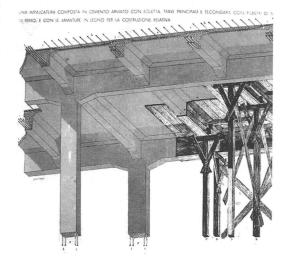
Typical reinforced concrete structural system, consisting of pillars, main and secondary beams and slab, constructed according to the Hennebique patent. (Formenti 1893)
